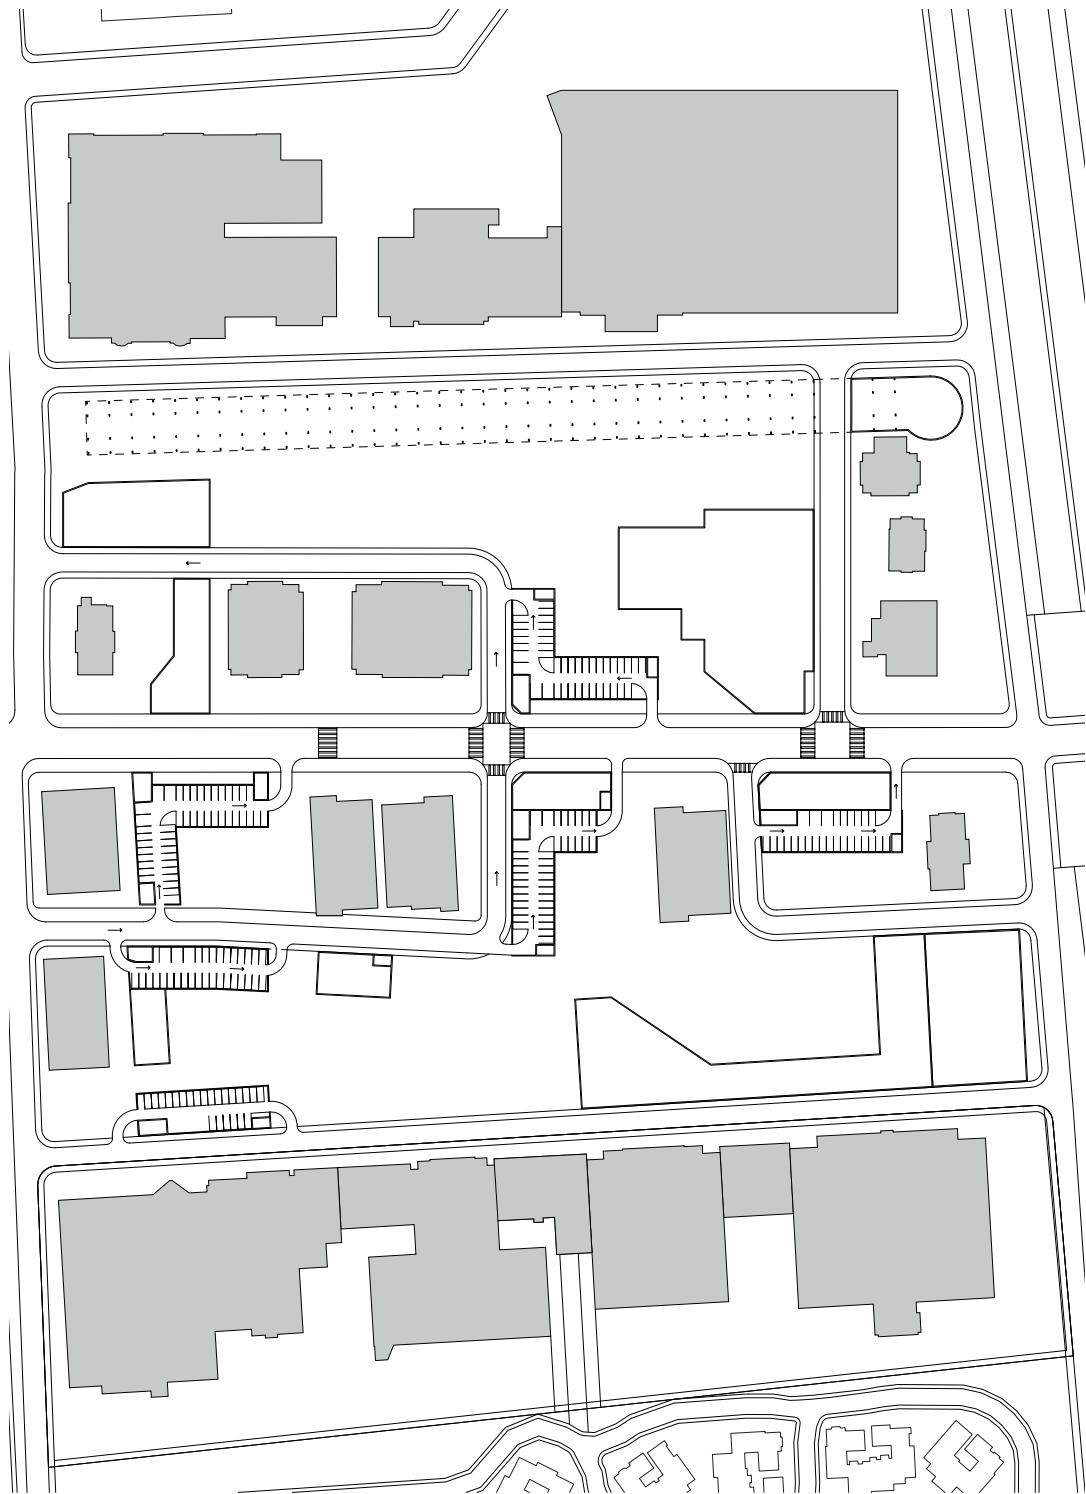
site plan—new buildings: ground level (1:2,500)
